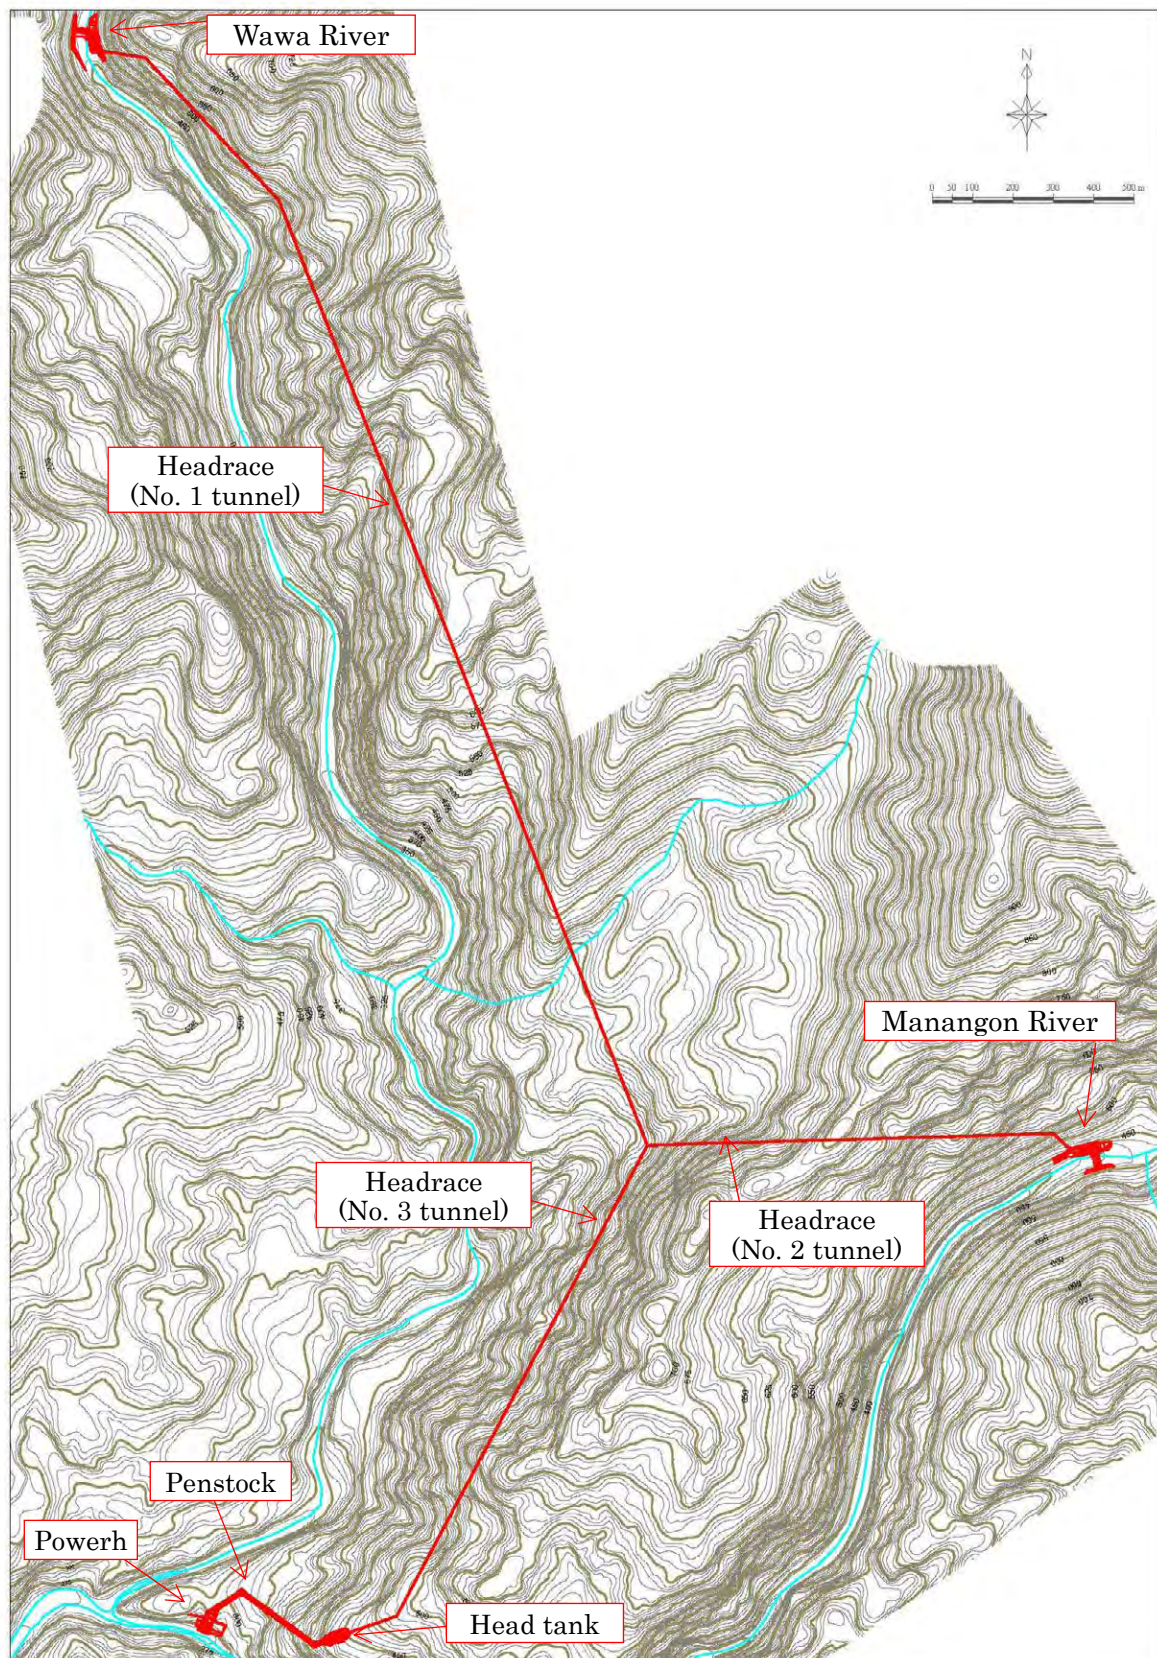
Overall Plan of Wawa No. 2 Powerhouse
